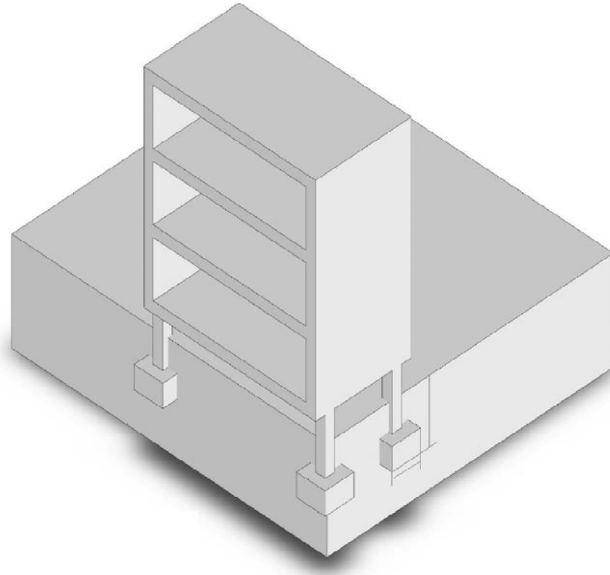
Sketch showing a typical shallow foundation, from [Helwany \(2007\)](#).
